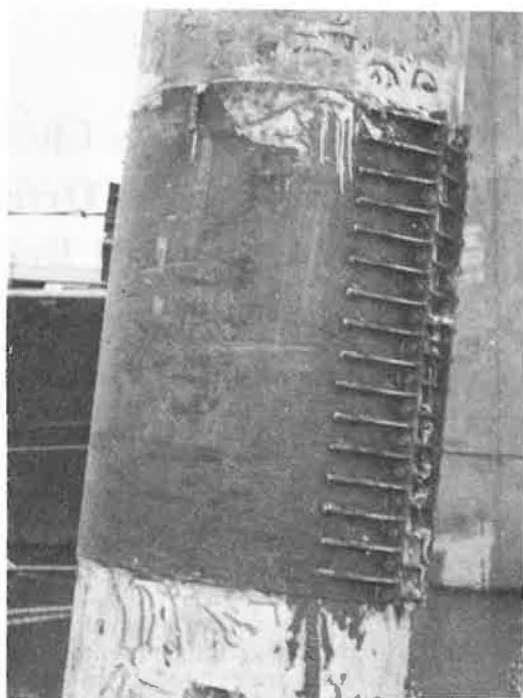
Steel reinforcing band as placed on pile 1 Bent 26—epoxied and bolted in place after deleterious material had been removed and replaced with dry pack concrete.
